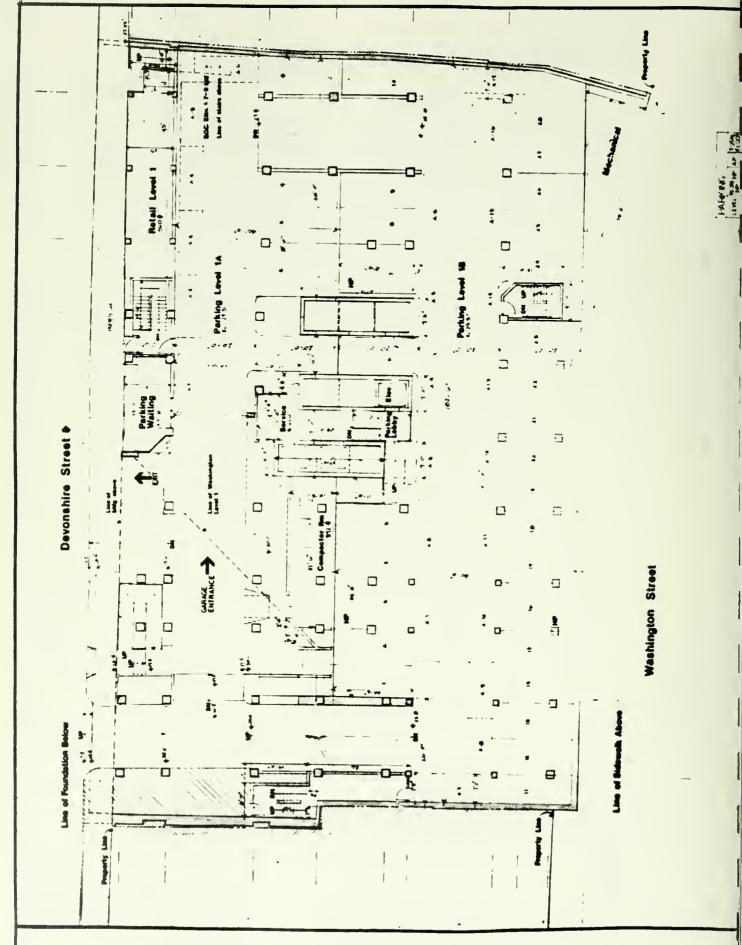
FLOOR PLAN OF DEVONSHIRE STREET LEVEL
